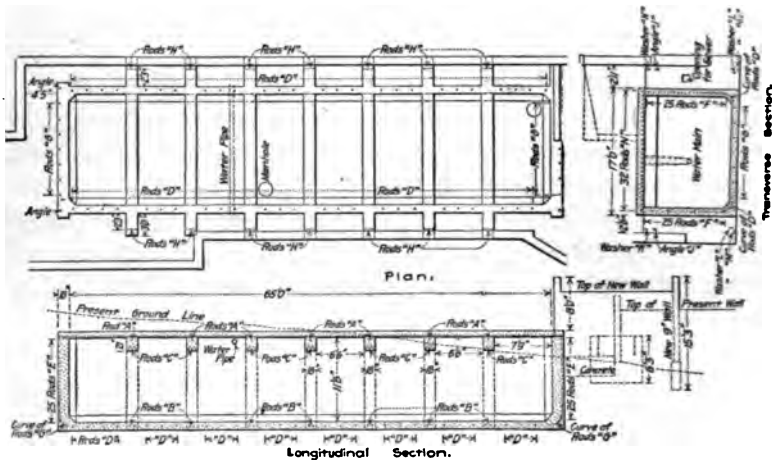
Rectangular Tank, Pittsburg Lamp, Brass and Gas Co.'s Works.
